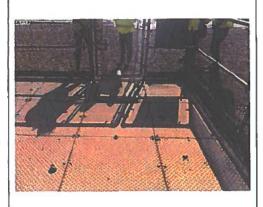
Crumbles Outfall - Outer chamber (Beach) hatch.
